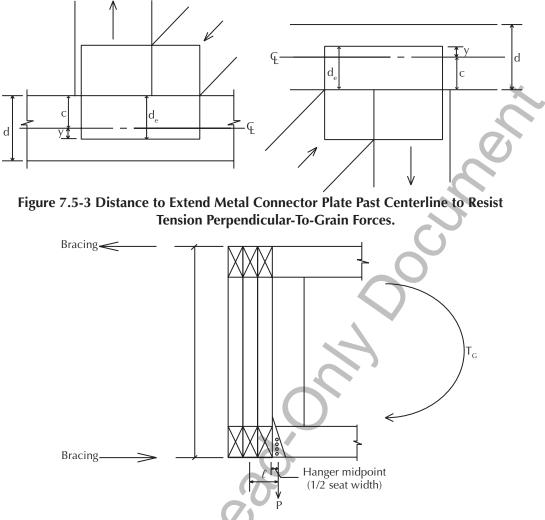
Secondary Torsional Stresses, T_G, Induced by Structural Members Framing into Girders.
